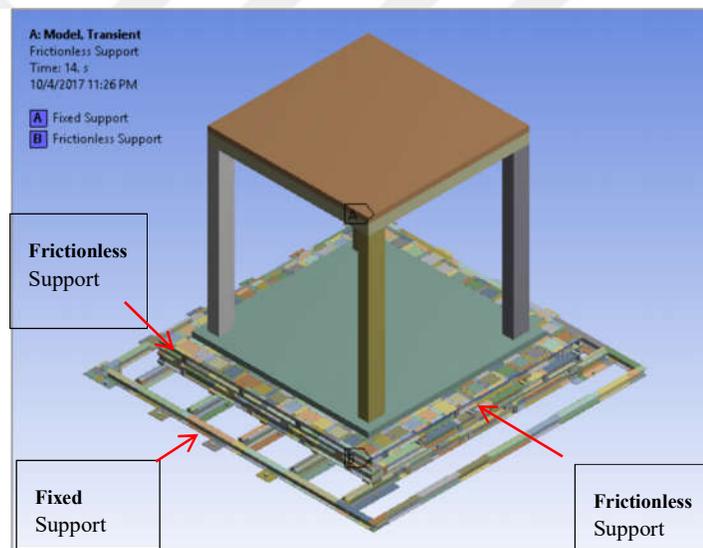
Arrangement of the boundary conditions of model of the single story-single bay RC building on the shaking table
